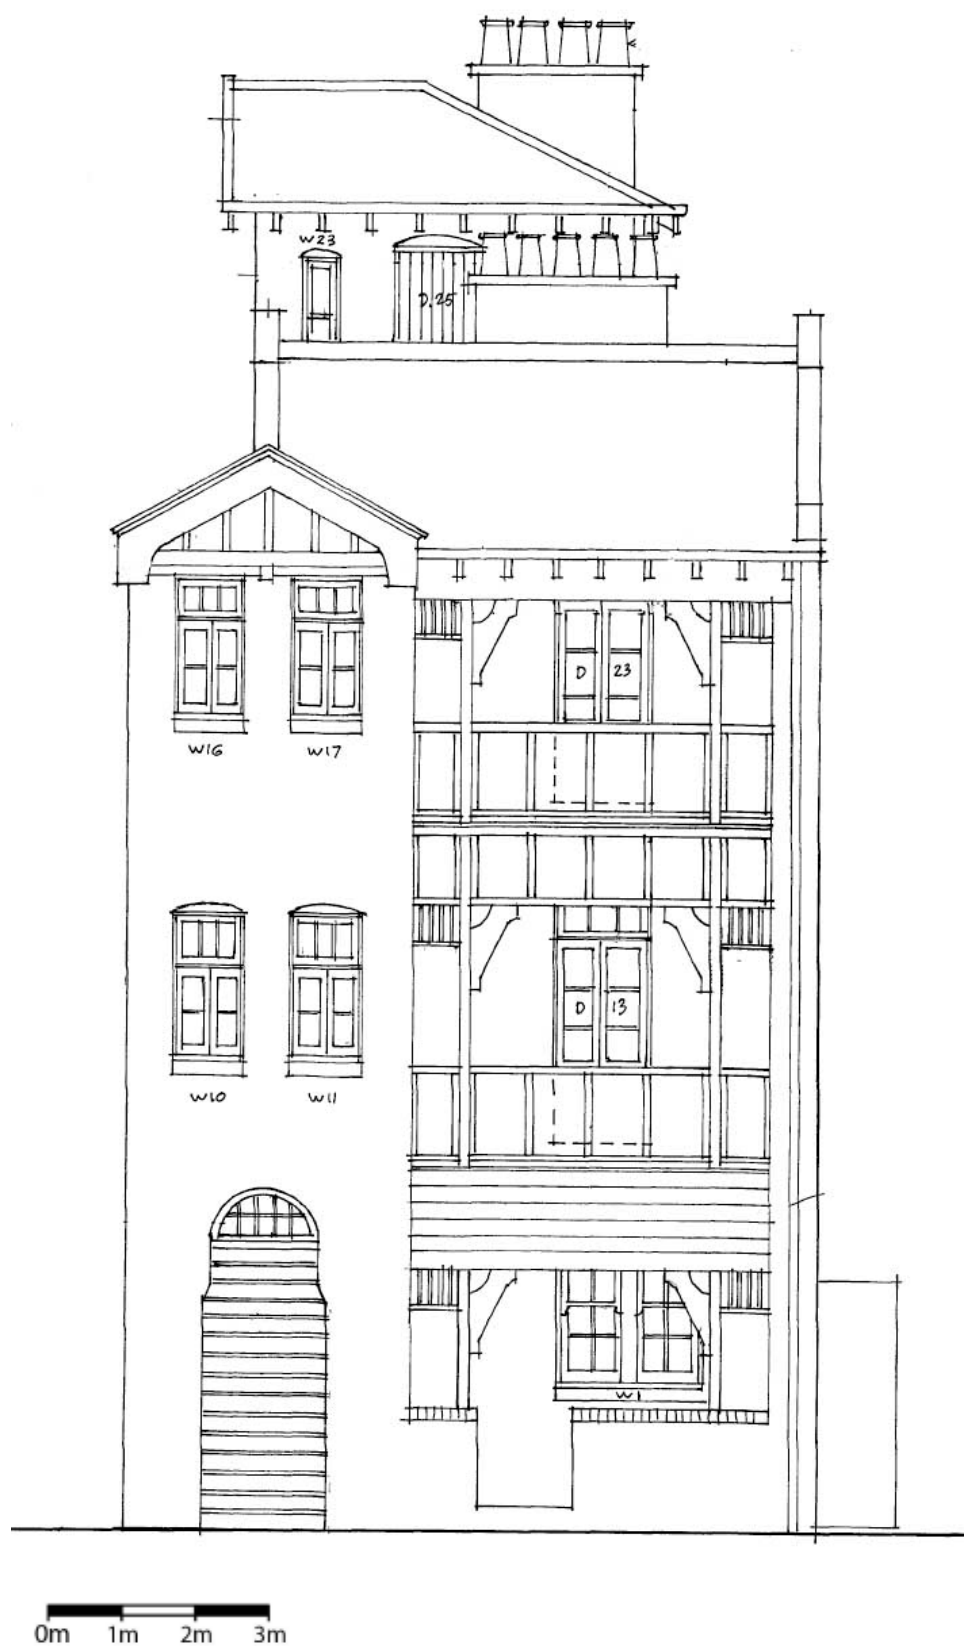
117-117A Gloucester Street – Front (East) elevation. Source: CLSP
